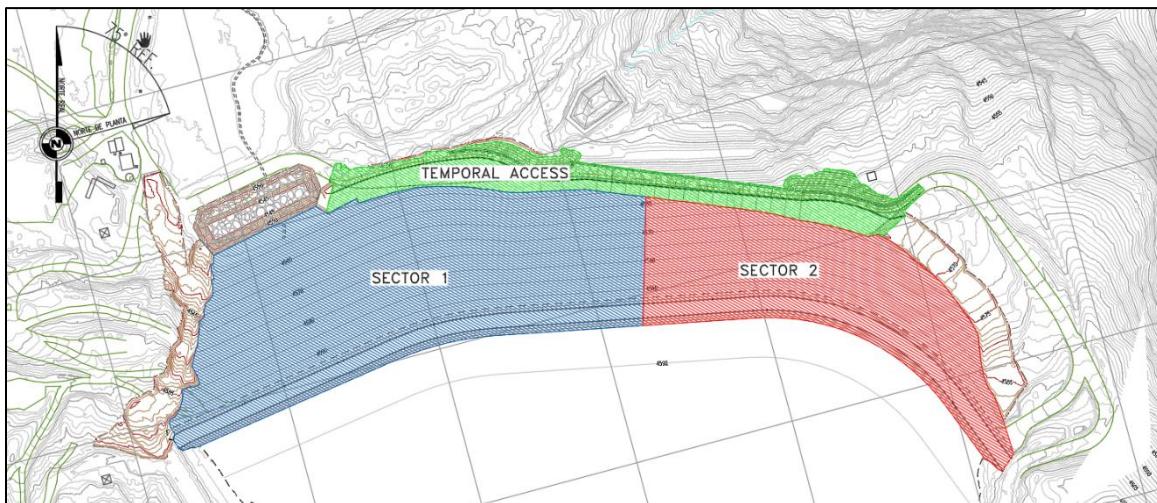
Plan view – Temporary Access Road along two sectors or subsectors in 5B1-Dam
